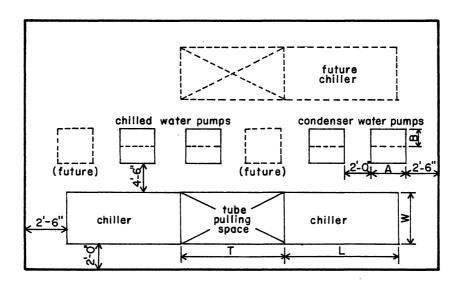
Typical Refrigeration Equipment Room Layout (21)
